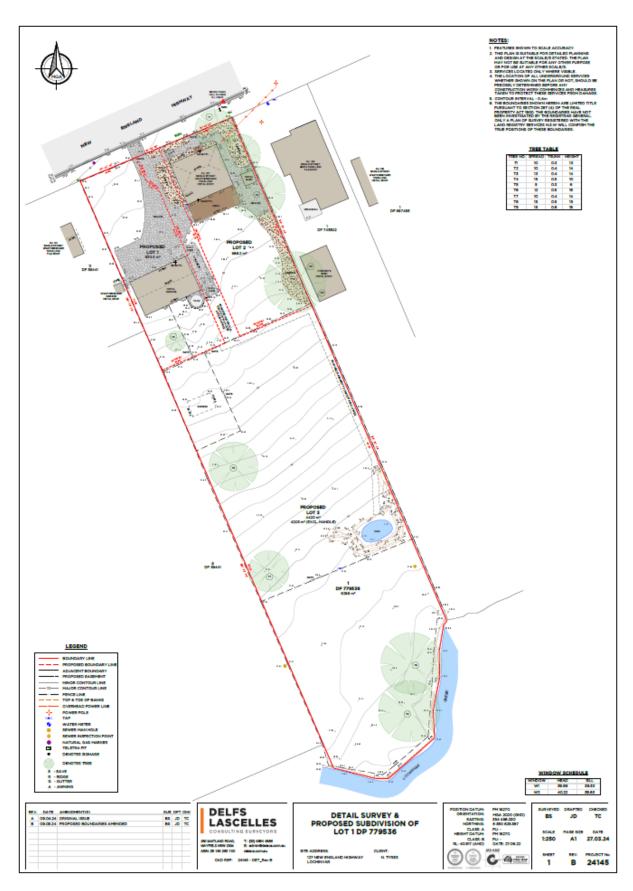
Proposed Plan of Subdivision (Delfs Lascelles, 2024)
